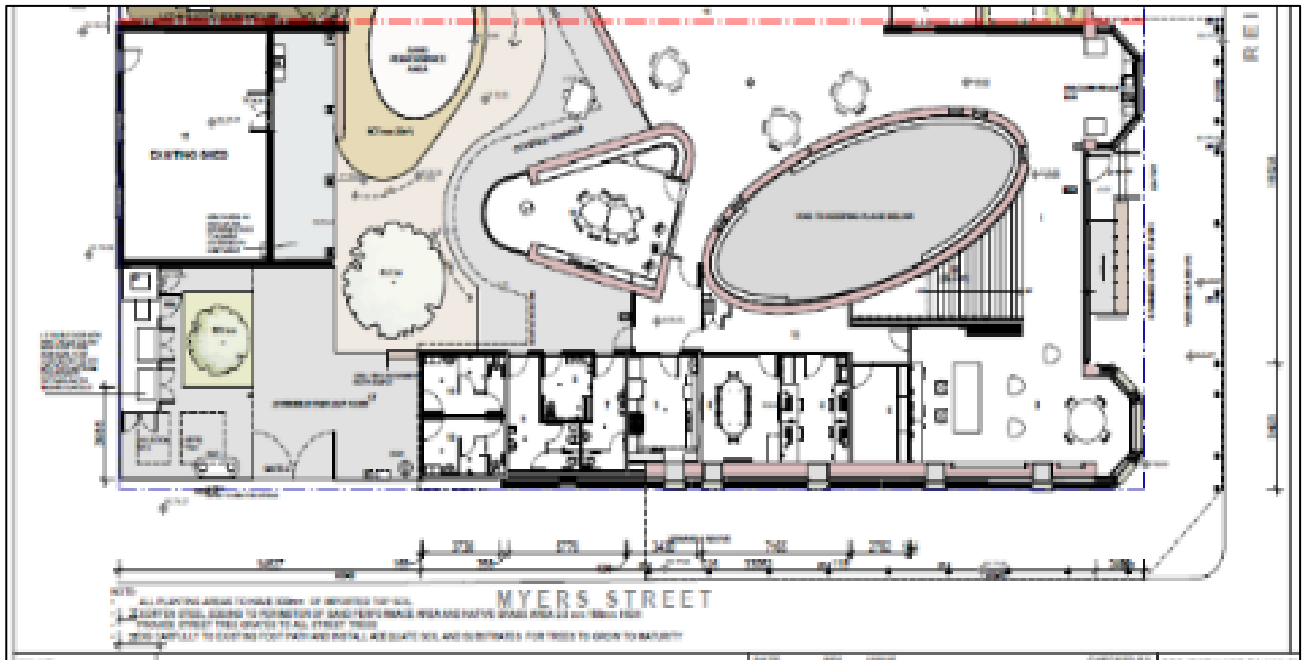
Ground floor plan of new Baaka Cultural Centre at 44 Reid Street Wilcannia (Source Kaunitz Yeung Architecture 2021)
